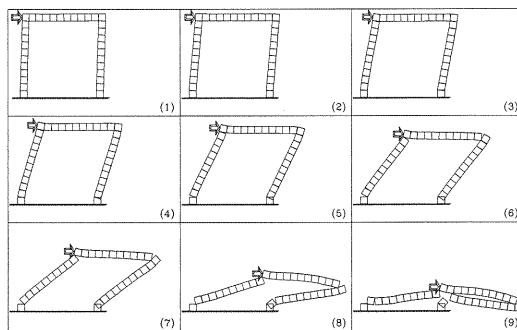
Failure pattern of a RC concrete frame subjected to lateral load
